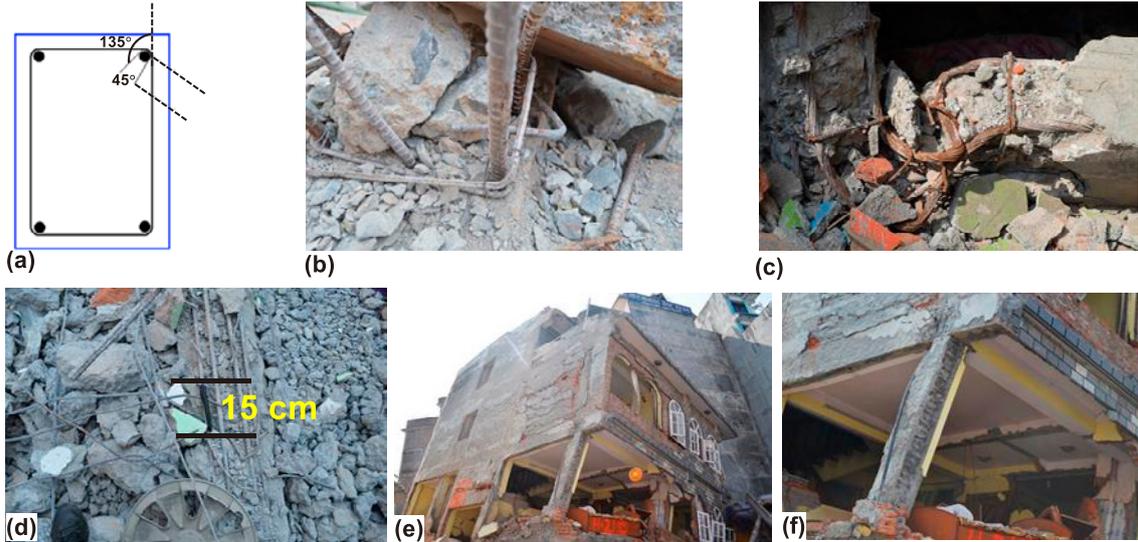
(a) Indian standard of stirrup, (b) in appropriate anchorage bend, (c) column joint failure, (d) stirrup spacing is approached 15 cm or greater and (e and f) soft-storey failure due to undersized column.
